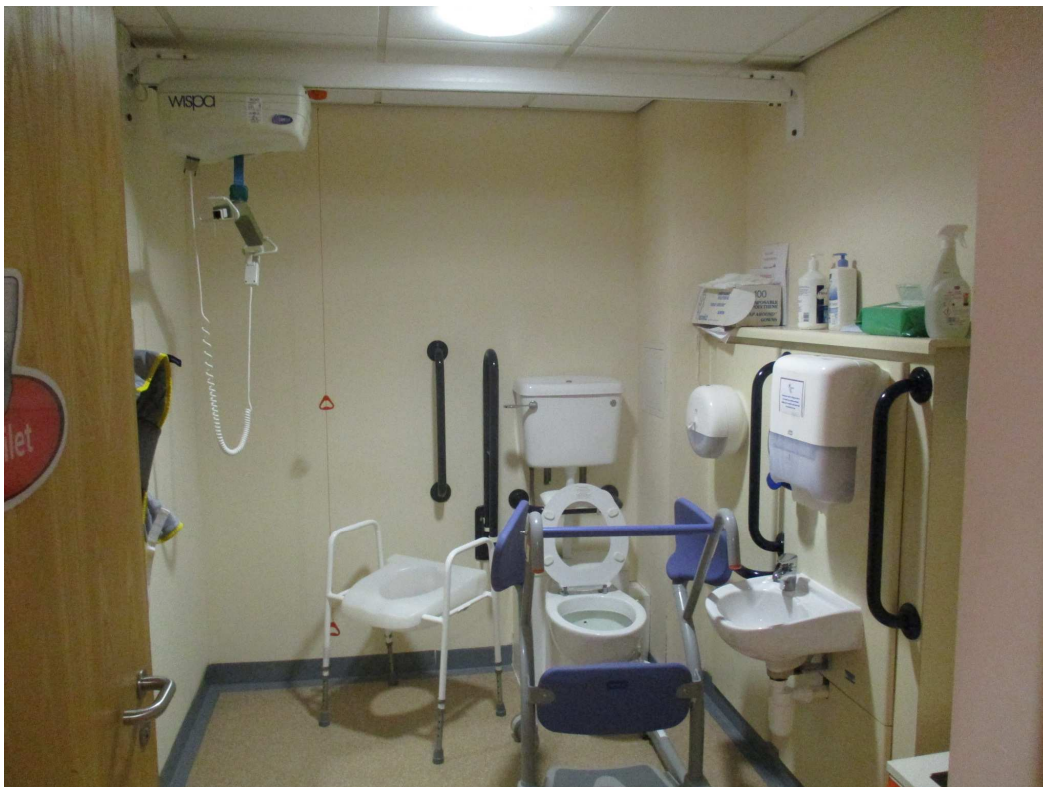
Corner layout Accessible WC, with various toiling aids and tracked hoist.
